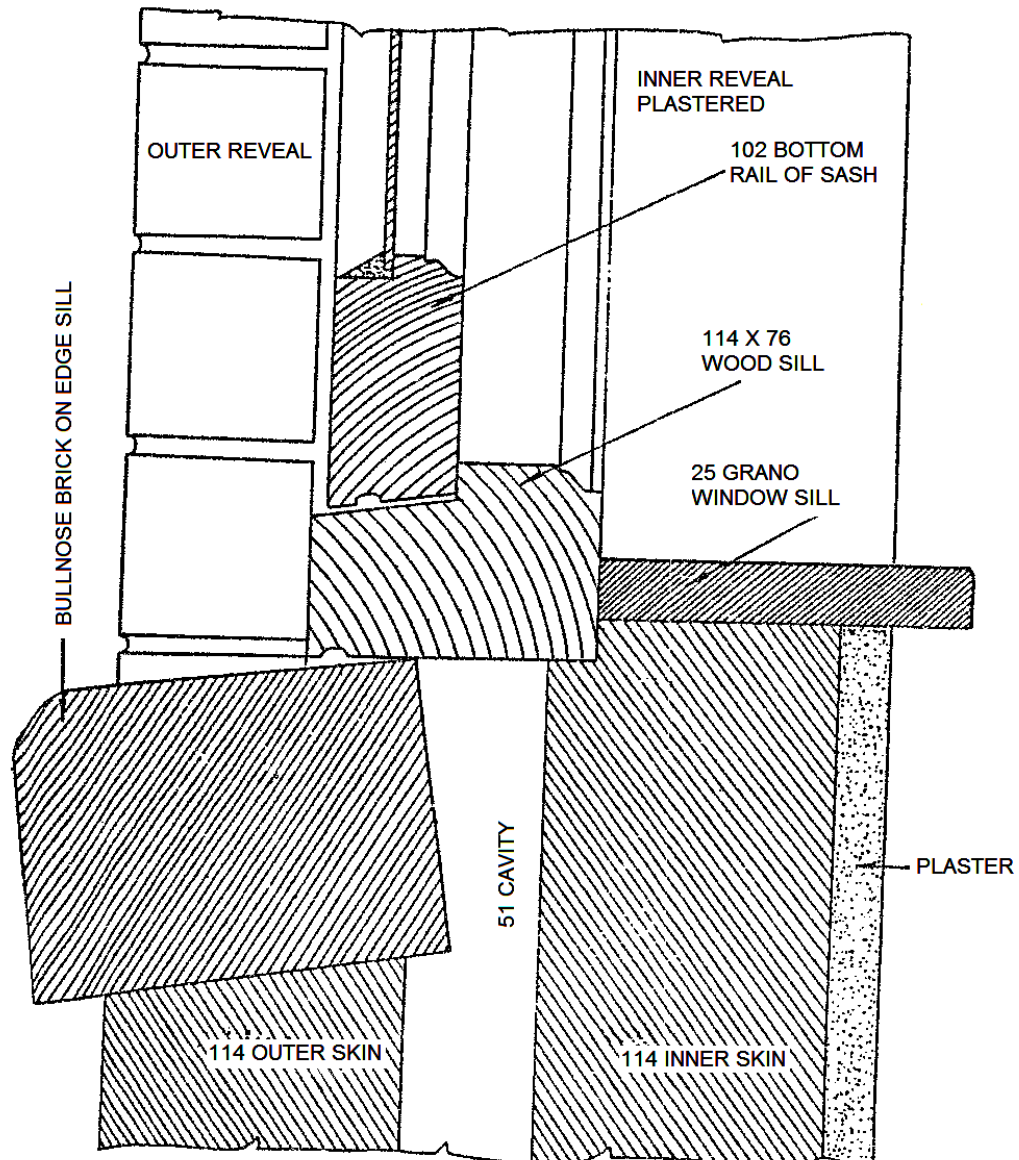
Section through 280 mm cavity wall showing treatment of wood window sill
